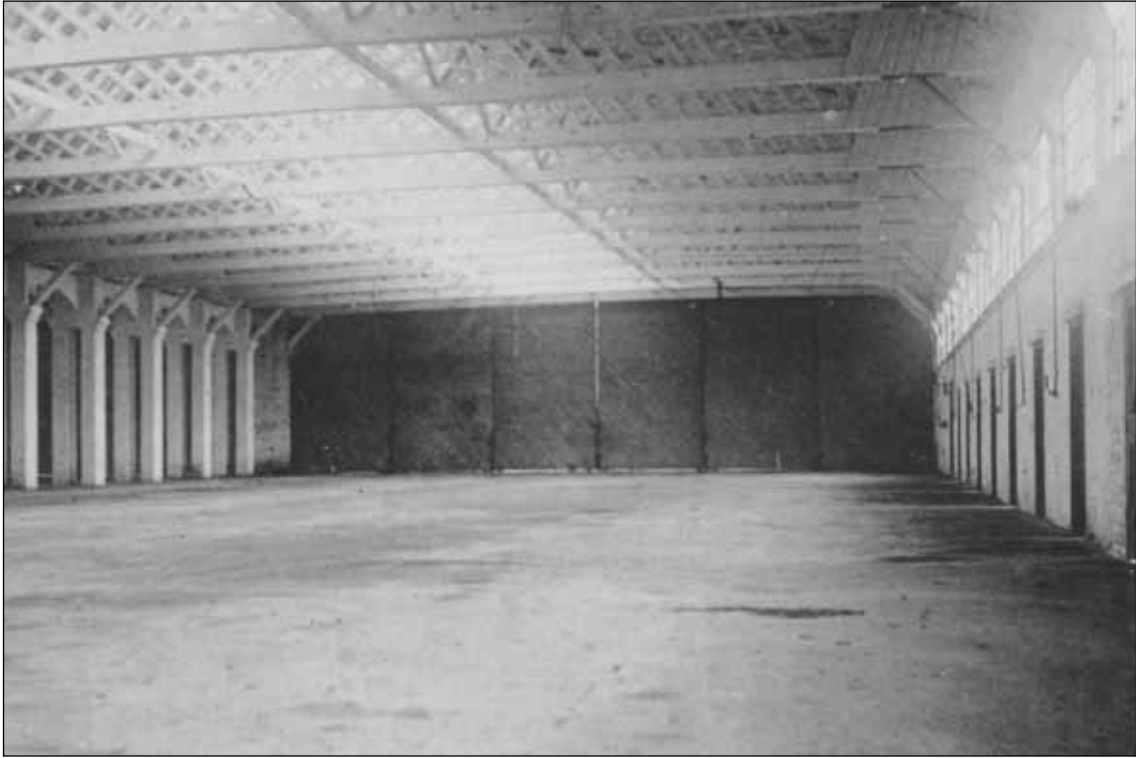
Interior of Building 18 photographed in 1923 (© Hooton Park Trust).
